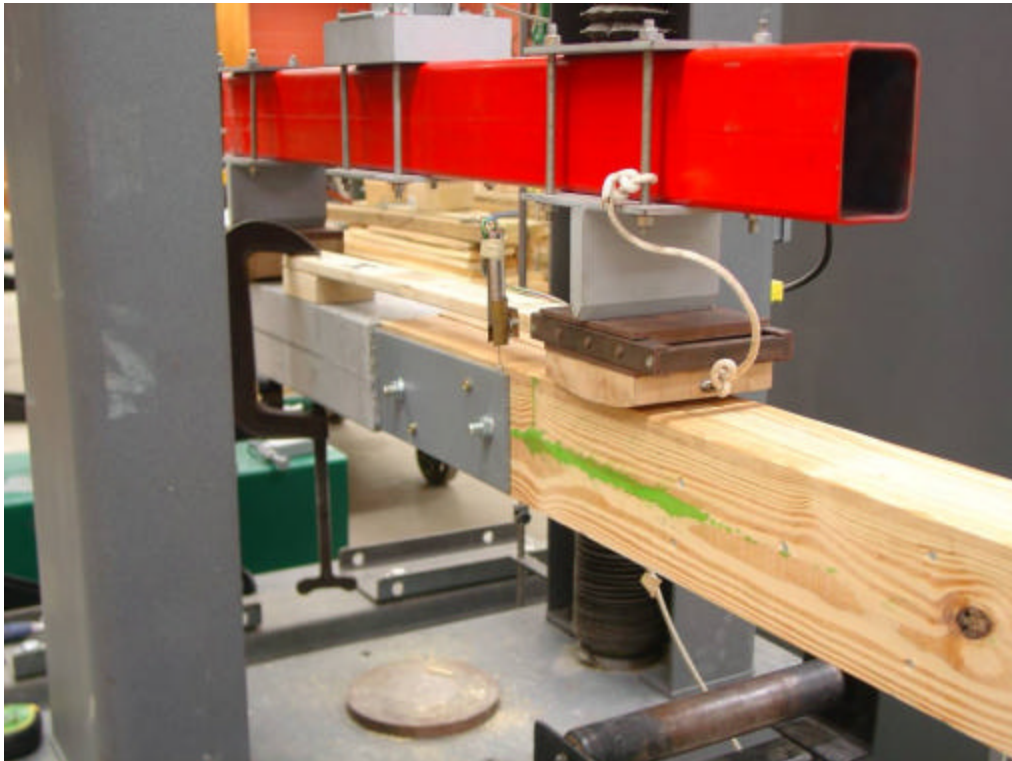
Bending test set-up for *Perma-Column* steel bracket to concrete column connection showing LVDT used to measure joint rotation.
